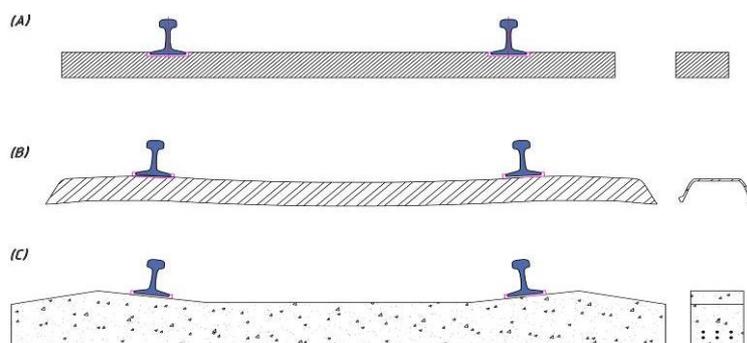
Existing sleepers: (a) Wooden, (b) Steel, (c) Prestressed concrete
